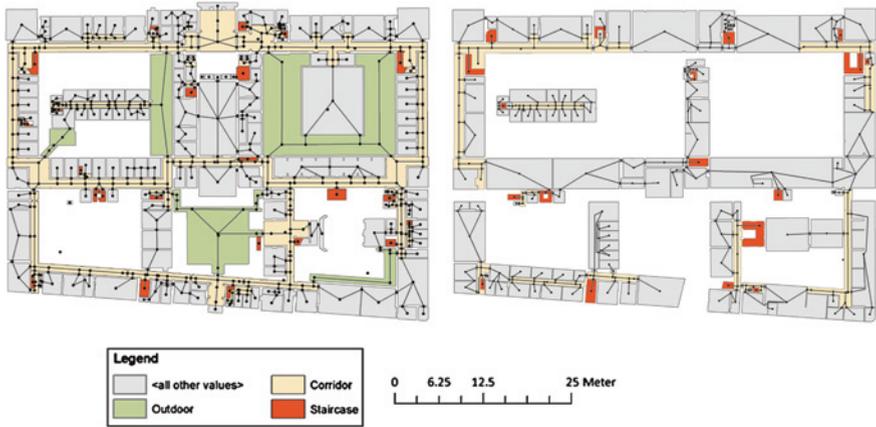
Floor plan of the ground floor (*left*) and first floor (*right*) with their 3D indoor network
